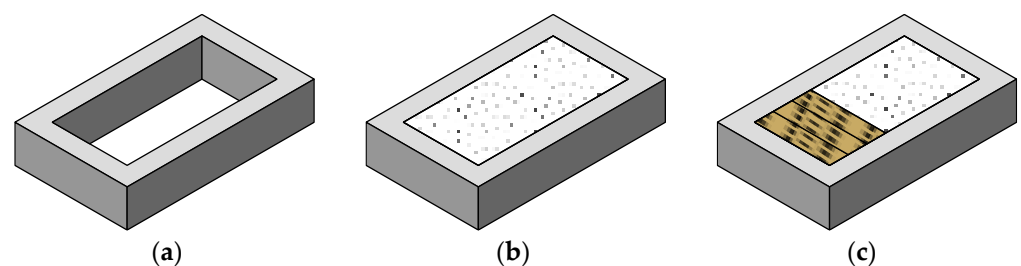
(a) Foundation frame, (b) foundation frame filled with gravel/stones, (c) installed wooden beams on the floor.
